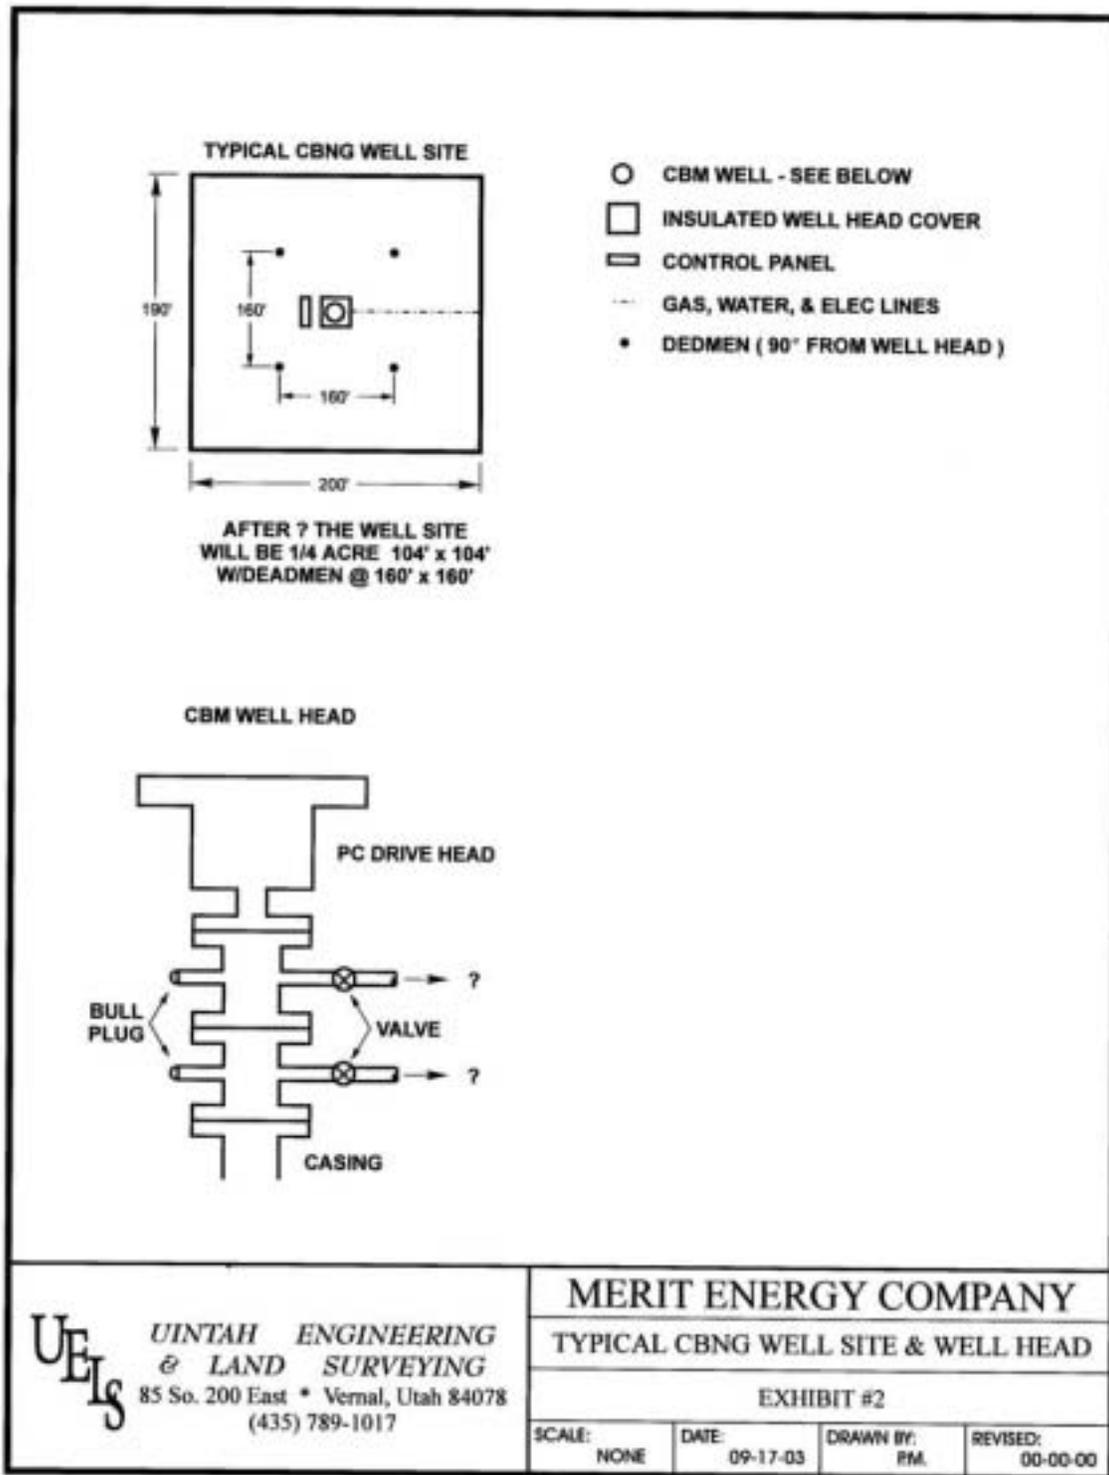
Typical CBM Drill Site Layout - Brown Cow Pod.
